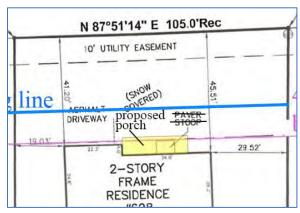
Proposed covered porch shown past the 40-foot front yard setback
